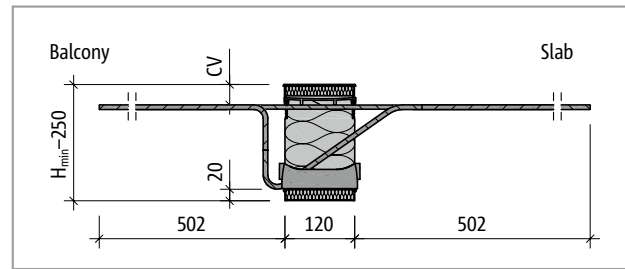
Schöck Isokorb® XT type K-M5, M6: Product section
